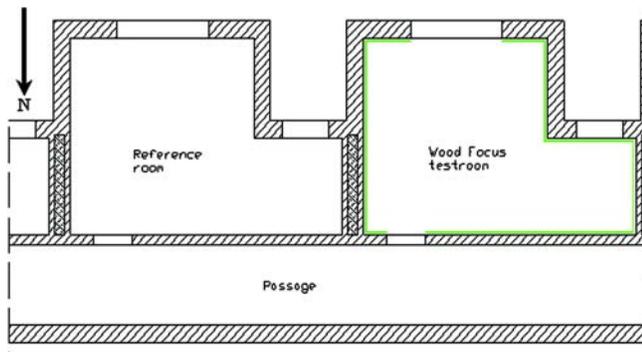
Ground plan of the two test rooms (Kuenzel et al. 2004).
